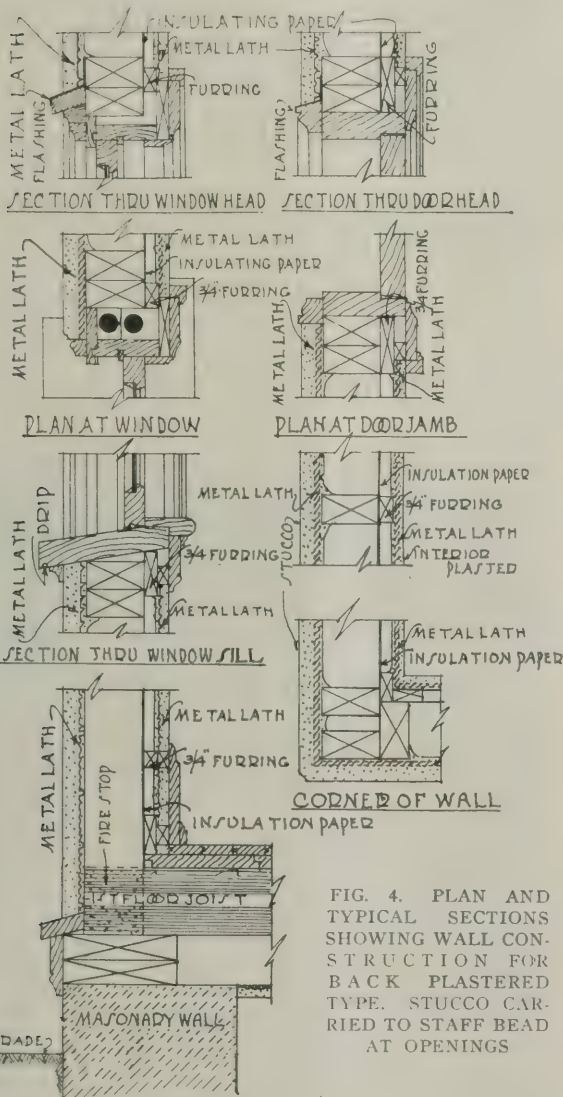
PLAN AND TYPICAL SECTIONS SHOWING WALL CONSTRUCTION FOR BACK PLASTERED TYPE. STUCCO CARRIED TO STAFF BEAD AT OPENINGS
